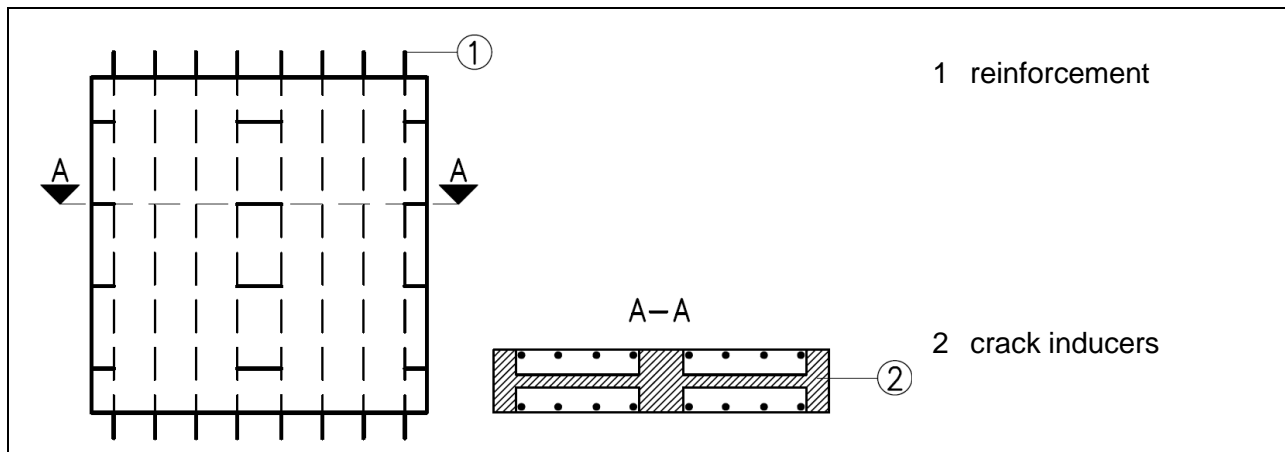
Example of a test member for fasteners tested in cracked concrete
